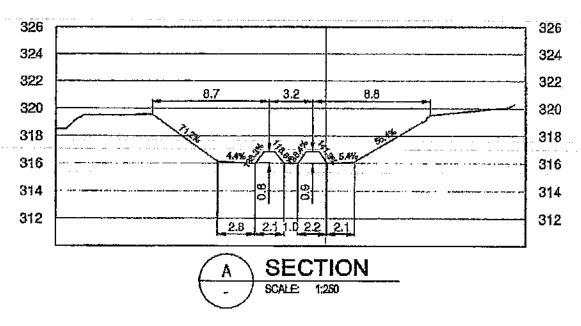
SETTLING POND CROSS SECTION FROM AS-BUILTS
